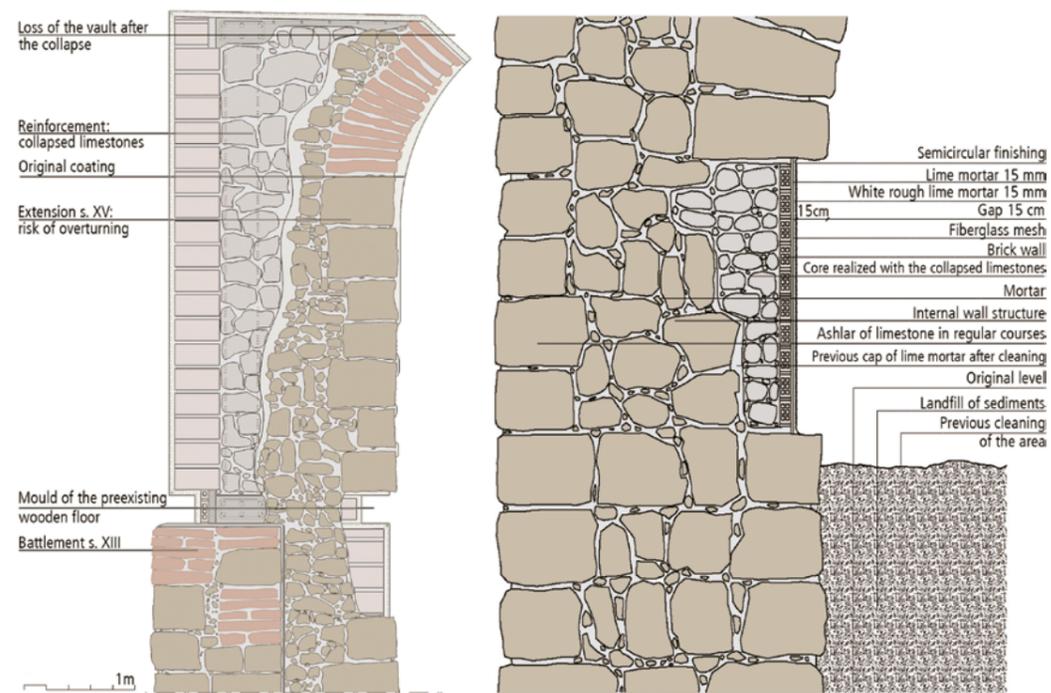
Southern wall details, after the restoration (Source: Carquero Arquitectura, 2016a)
